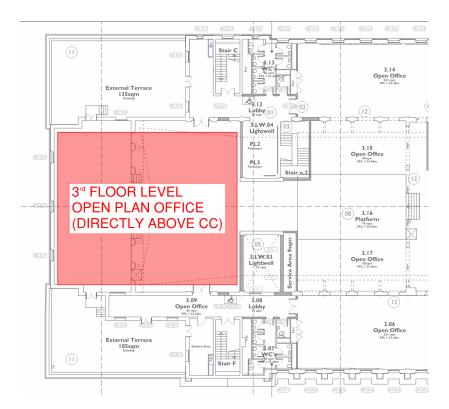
Vertical adjacencies to Camden Centre on Third Floor level in proposed development
